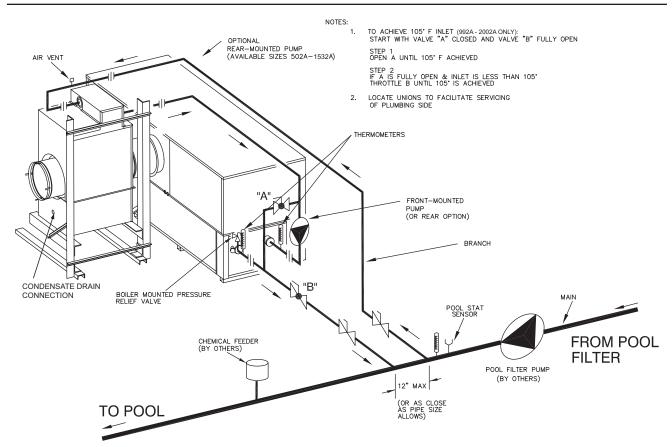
Single Heater - Pool System Primary/Secondary with Rear-Mounted CHX
